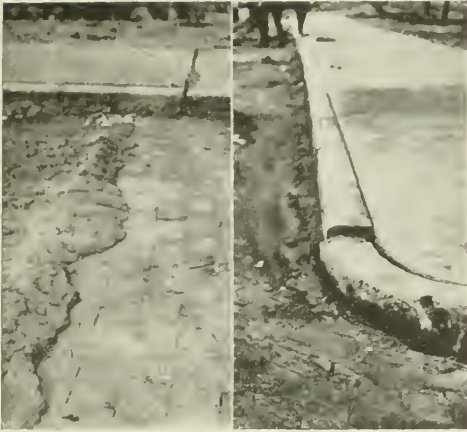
RIGHT: CURB PUSHED OUT OF ALINEMENT BY EXPANSION OF A WOOD BLOCK PAVEMENT. LEFT: BITUMINOUS MATERIAL SQUEEZED OUT OF EXPANSION JOINT.
